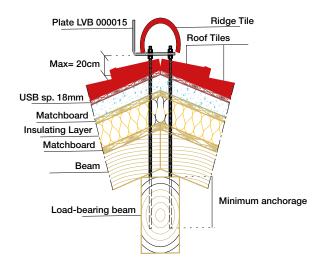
Cross-section of the LVB device fixed to a wooden support structure.
